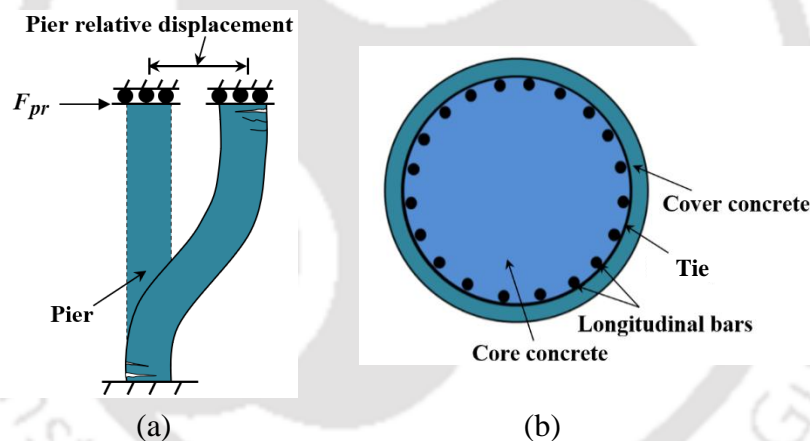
(a) Seismic deformation pattern of pier in the transverse direction of the bridge and (b) typical pier cross section.
